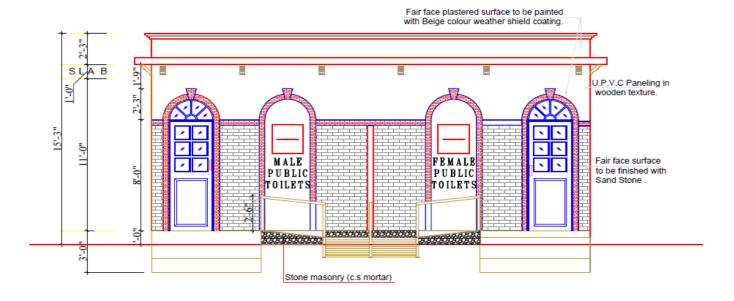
Site plan of the proposed toilet block at Lala Rukh Tomb, Attock
